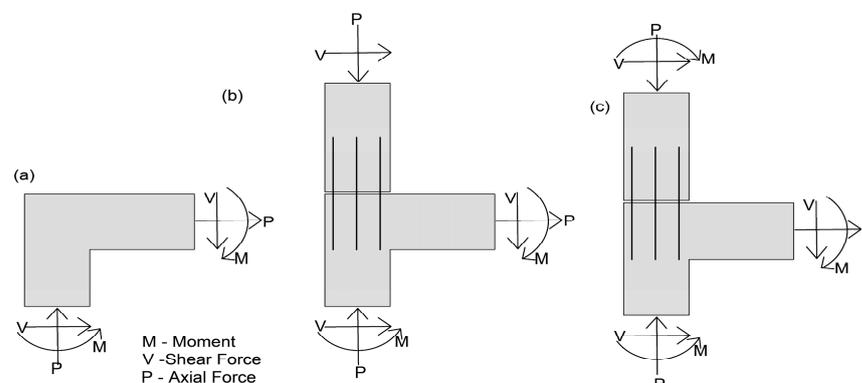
Column knee joint: (a) existing joint, (b) pinned connection, and (c) rigid connection.
